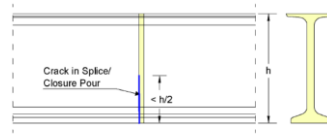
Cracks in NU girder splices and closure pours
